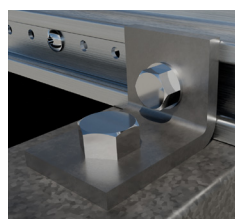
B : 1/4 Span Manufacturer Recommendation Hold Down Clamps
